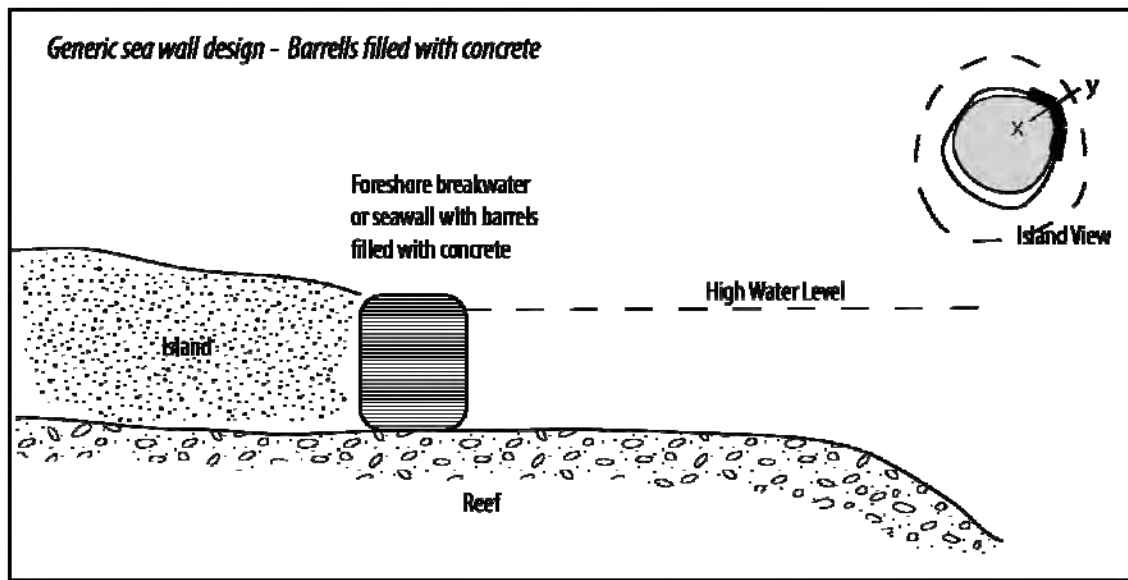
Generic sea wall design for 'barrels filled concrete'
